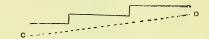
Possible Line of Rupture beneath Foundations in Clay.
